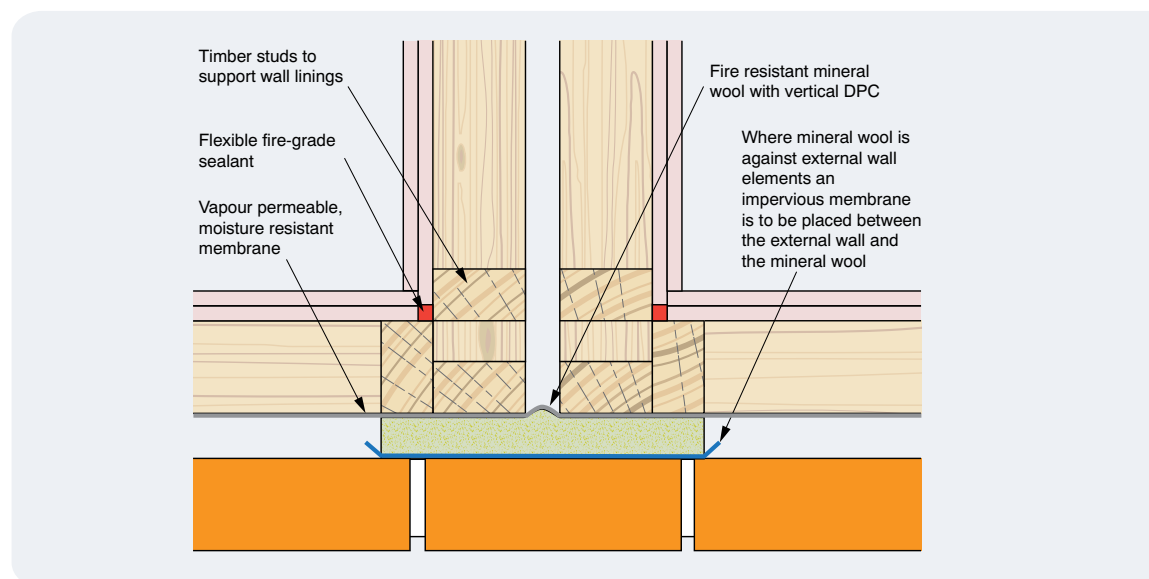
Double stud fire-protected timber internal wall intersecting a brick veneer wall.
